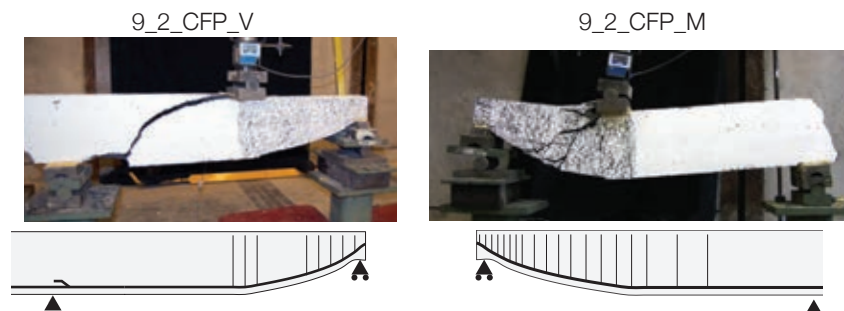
Reinforcement layouts and failure modes for Beams 9\_2\_CFP\_V and 9\_2\_CFP\_M.
